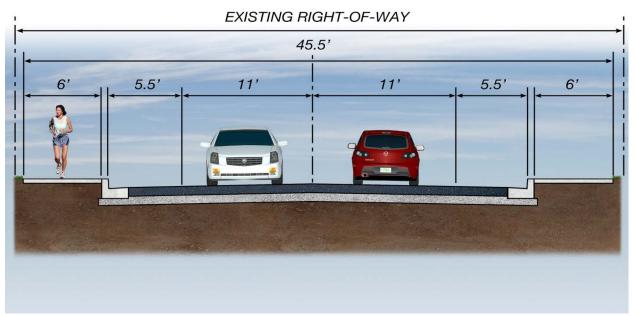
Proposed Roadway Section East of Proposed Movable Bridge
